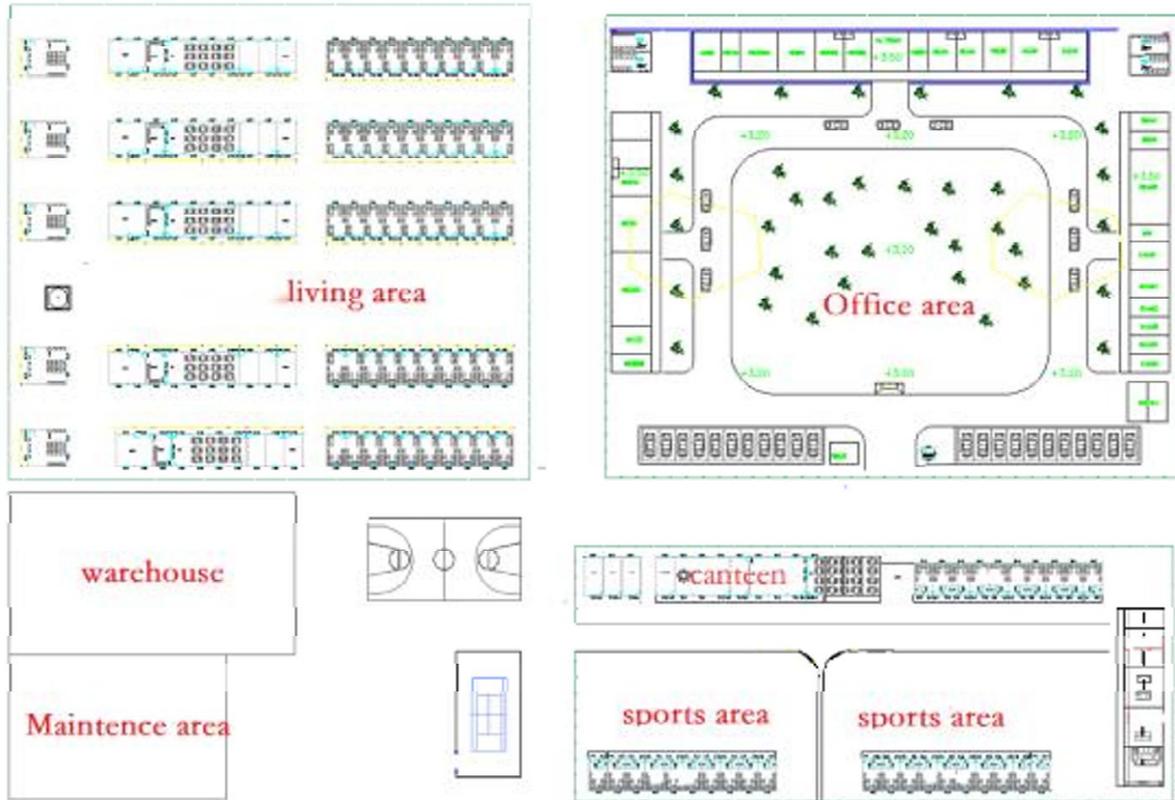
Overall Layout of Construction Camps and Temporary Facilities
